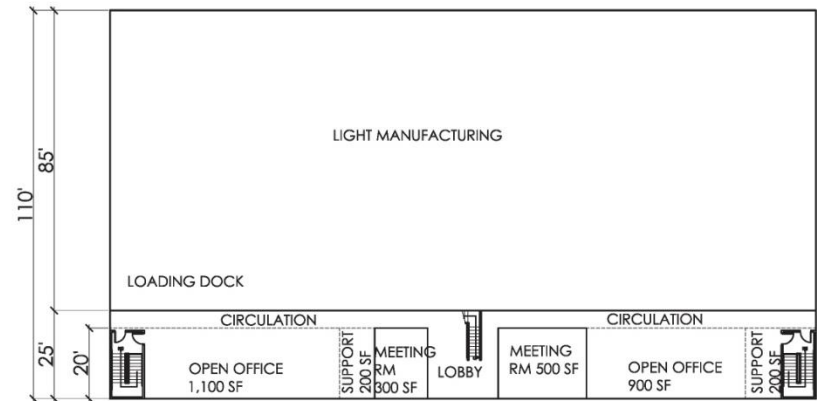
Code and net zero office/manufacturing first floor plan
